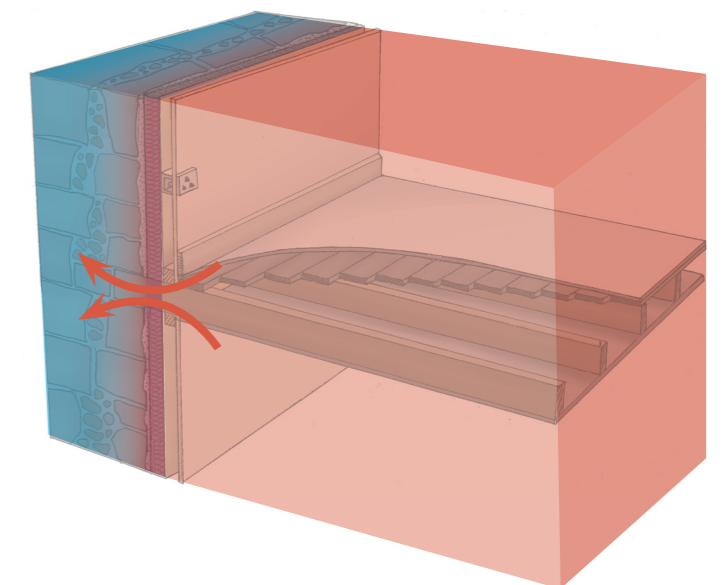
Detail coloured to show heat movement through thermal bridge at joist ends
